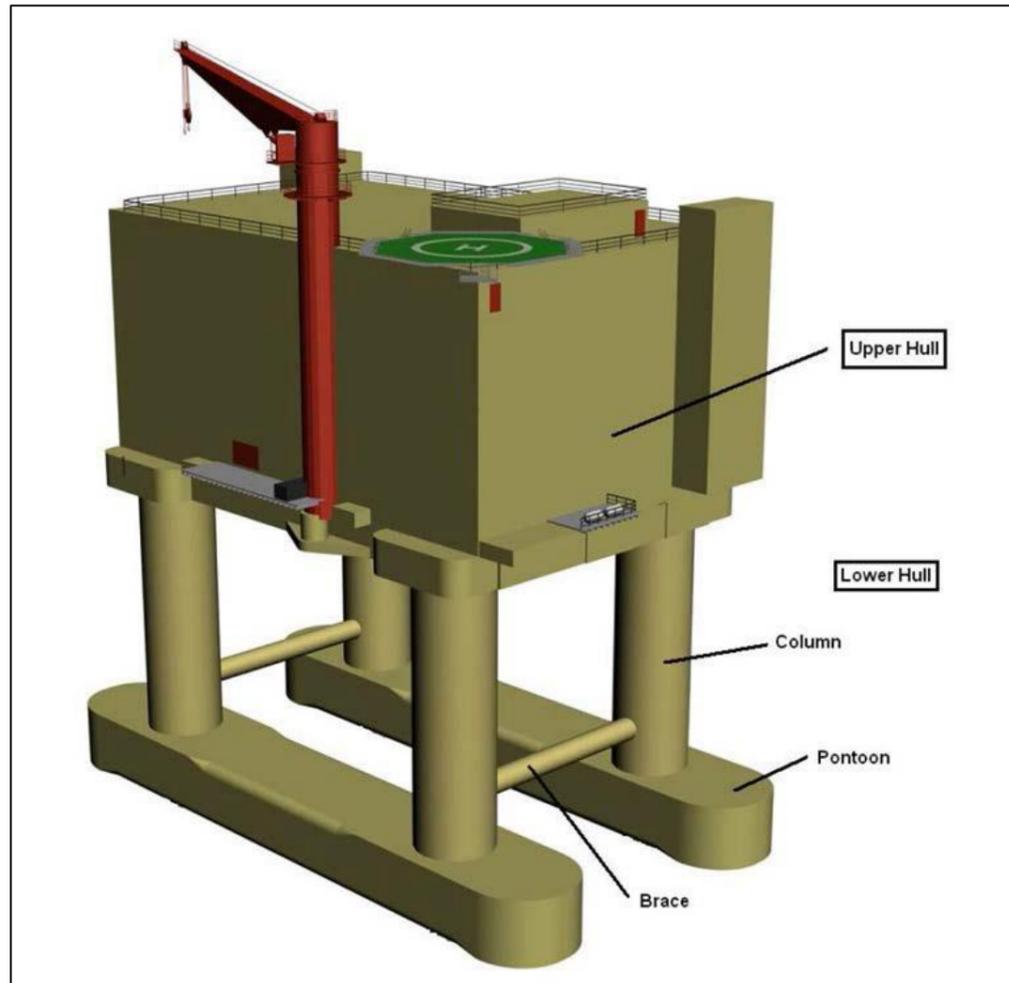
An example of a converter substation design supported by a pontoon gravity base – type 1¹ foundation.
